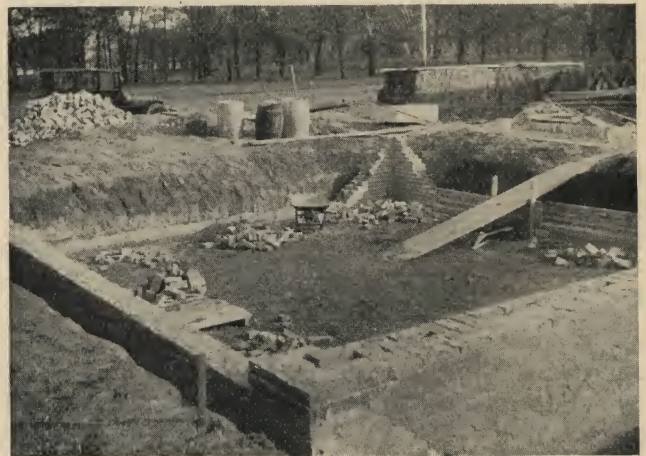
Note the small amount of equipment needed and the simplicity of building a brick basement.
